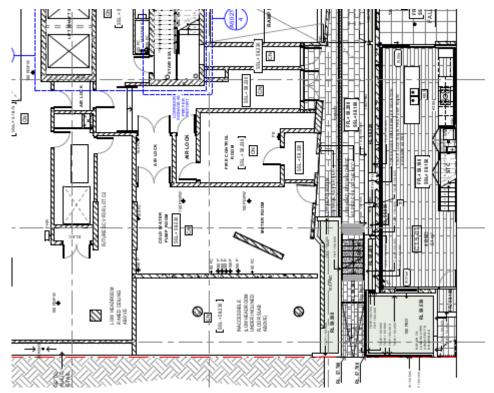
Extract from C1 Construction Drawings, showing the construction detailing of the fire control, pump room and plant room.
